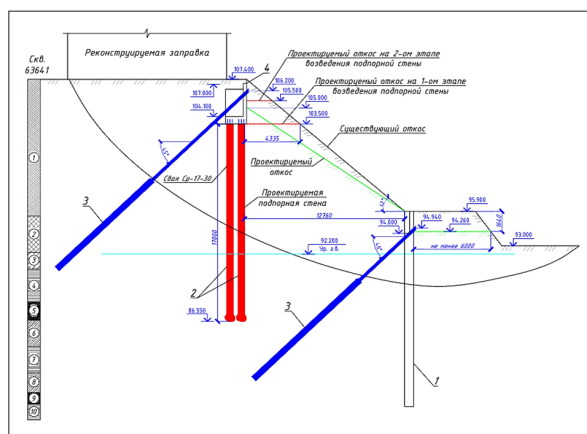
Cross-section of a leaning slope with anti-landslide recessed reinforced concrete structures.
